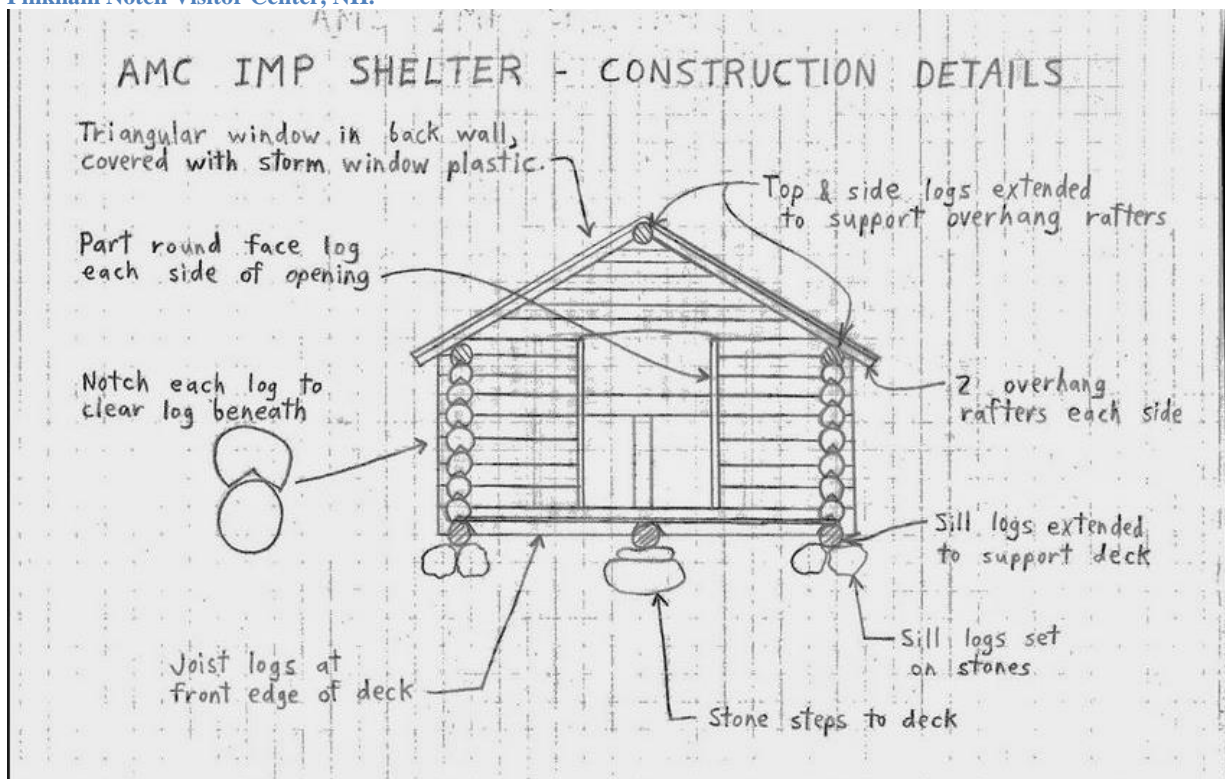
Imp shelter construction details for 1980 shelter, in Appalachian Mountain Club shelter management files housed at Pinkham Notch Visitor Center, NH.
